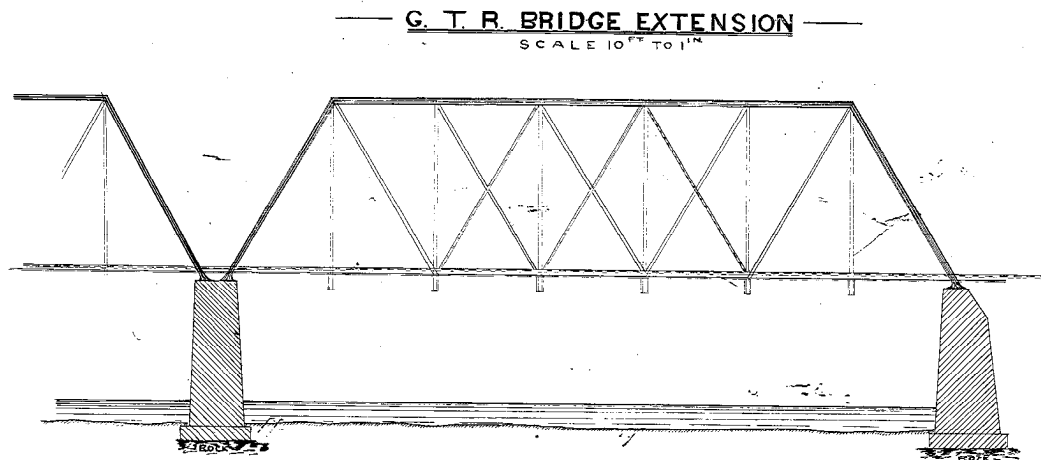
A proposed extension to the second BN&PB Railway bridge illustrated on an 1893 plan detailing “Grand River Improvements”
